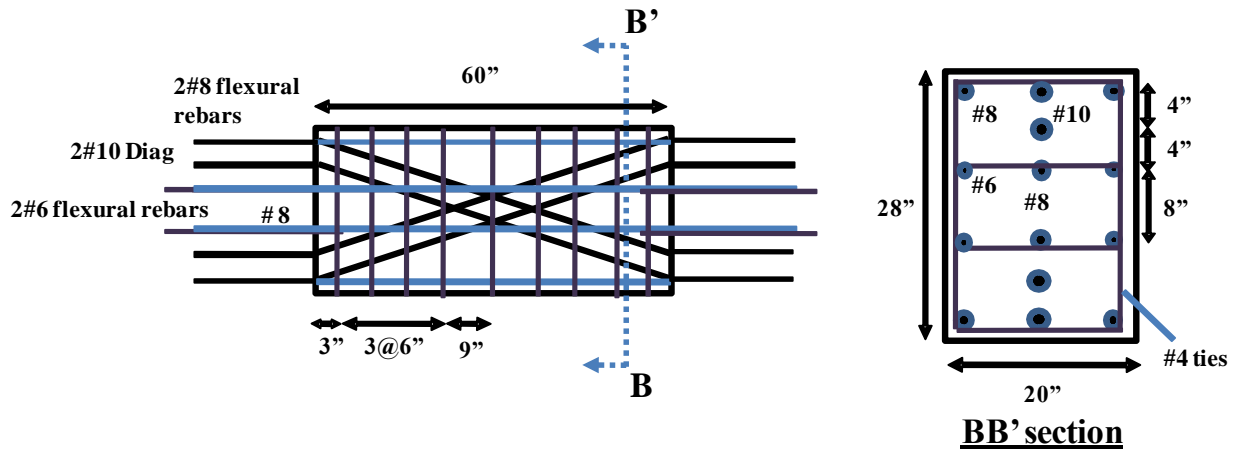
Reinforcement layout for HPFRC coupling beam
